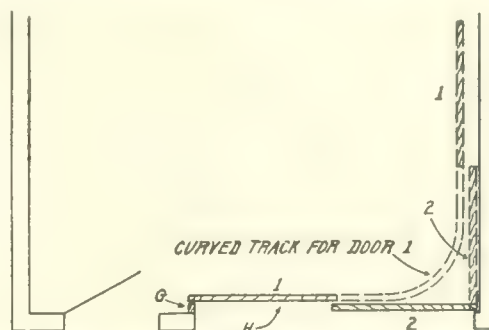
Right Angle Doors Requiring Minimum Space for Turn.
